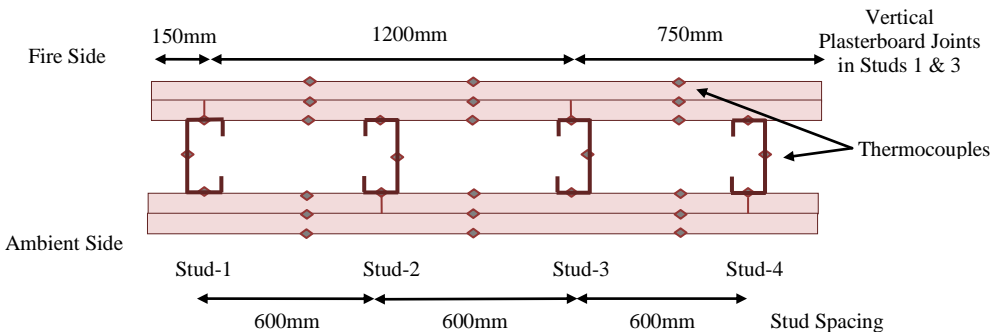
Typical arrangement of thermocouples for LSF wall specimen.
